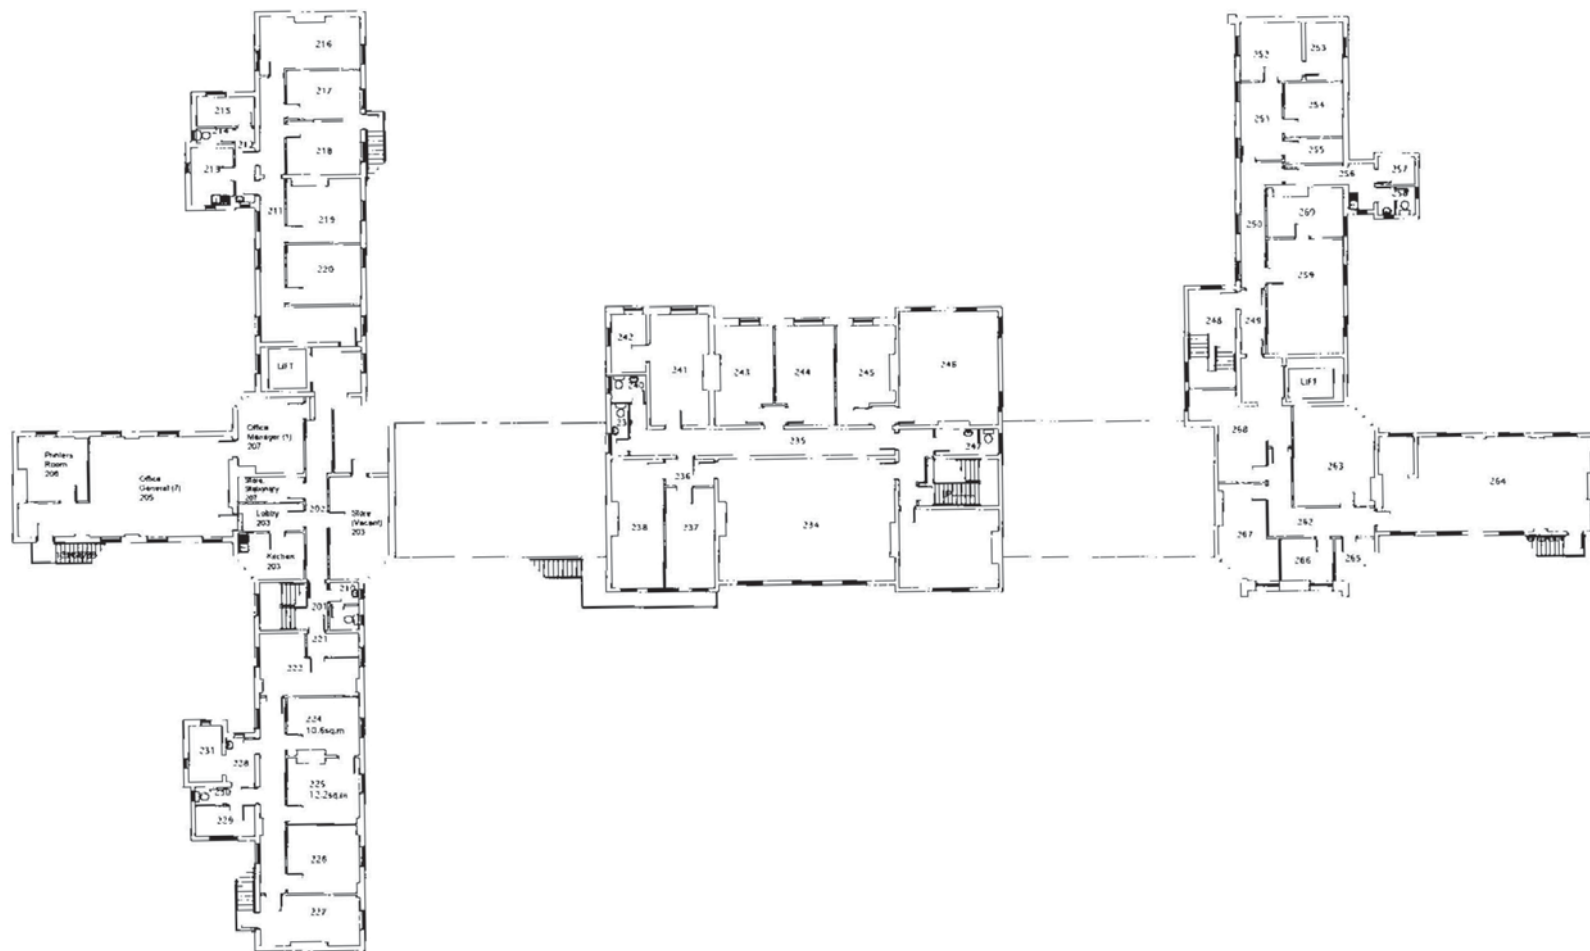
Workhouse floor plan in 1923 with single storied wings shown as hatched areas
